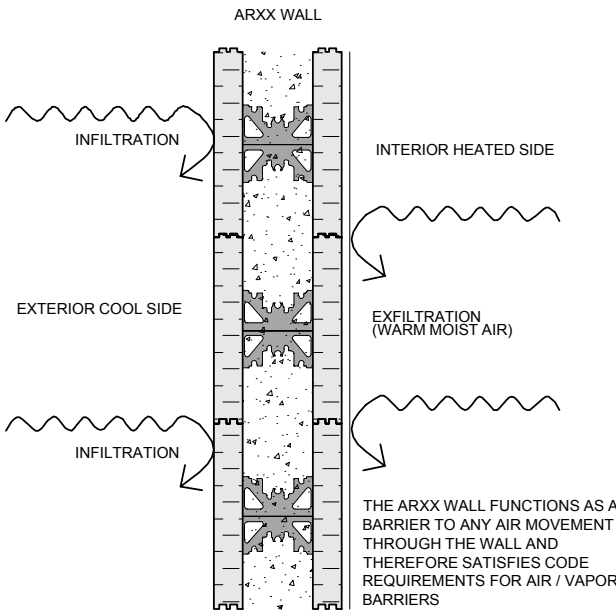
ARXX™ CONCRETE WALL EFFECT ON AIR PASSAGE
